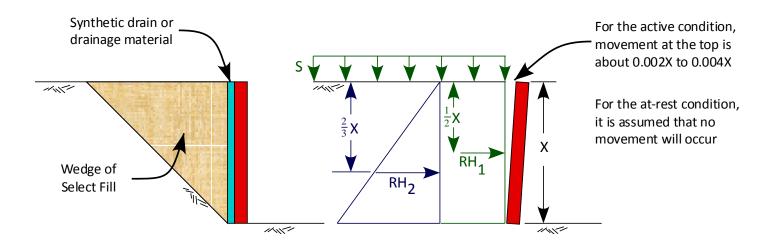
Sketch of Retaining Wall (not to scale, for illustrative purposes only)
